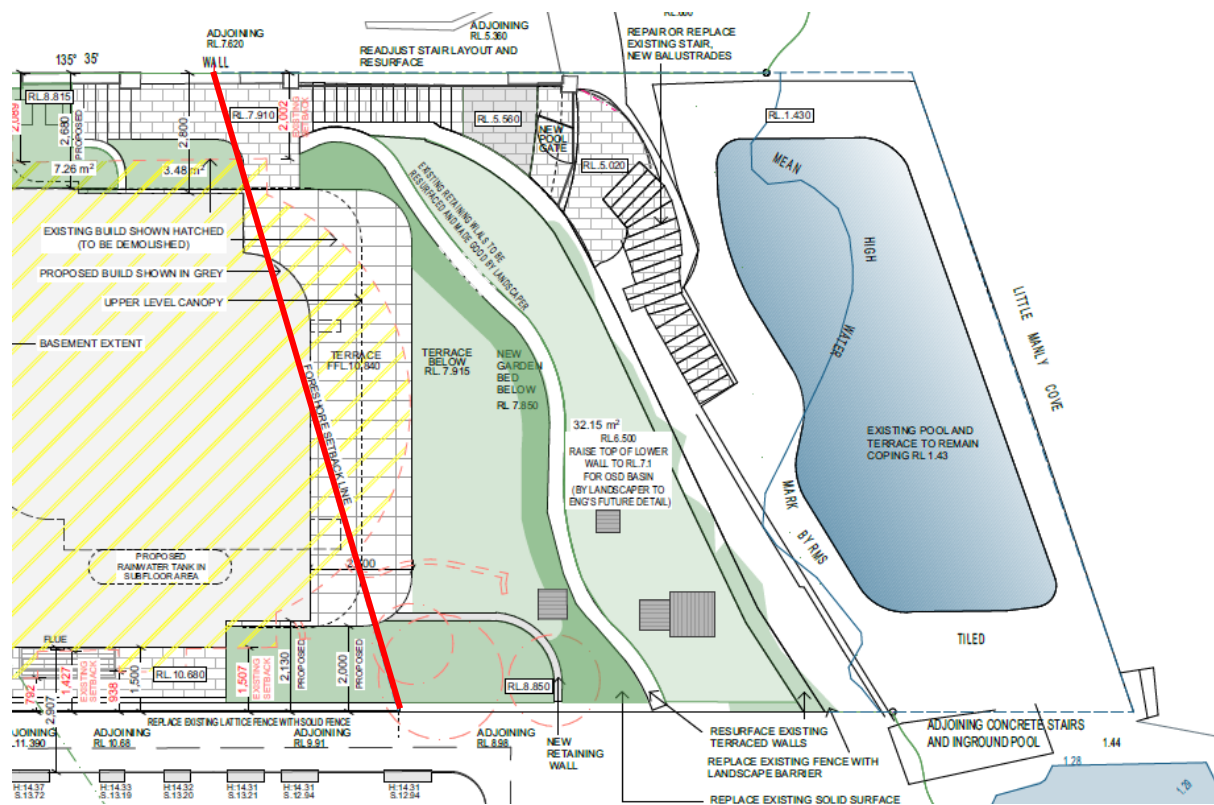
Extract of Site Plan (DA 02, revision M) with foreshore building line highlighted in red
